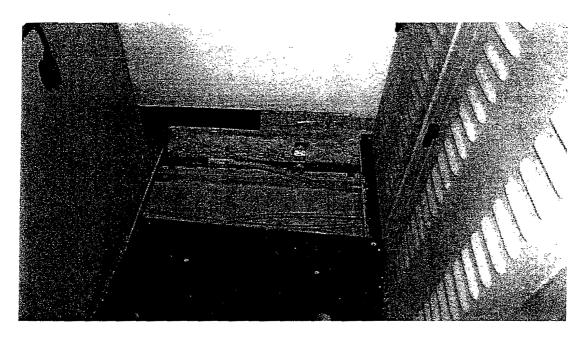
Sub Junction Level, Room SJ1, West Wall.
